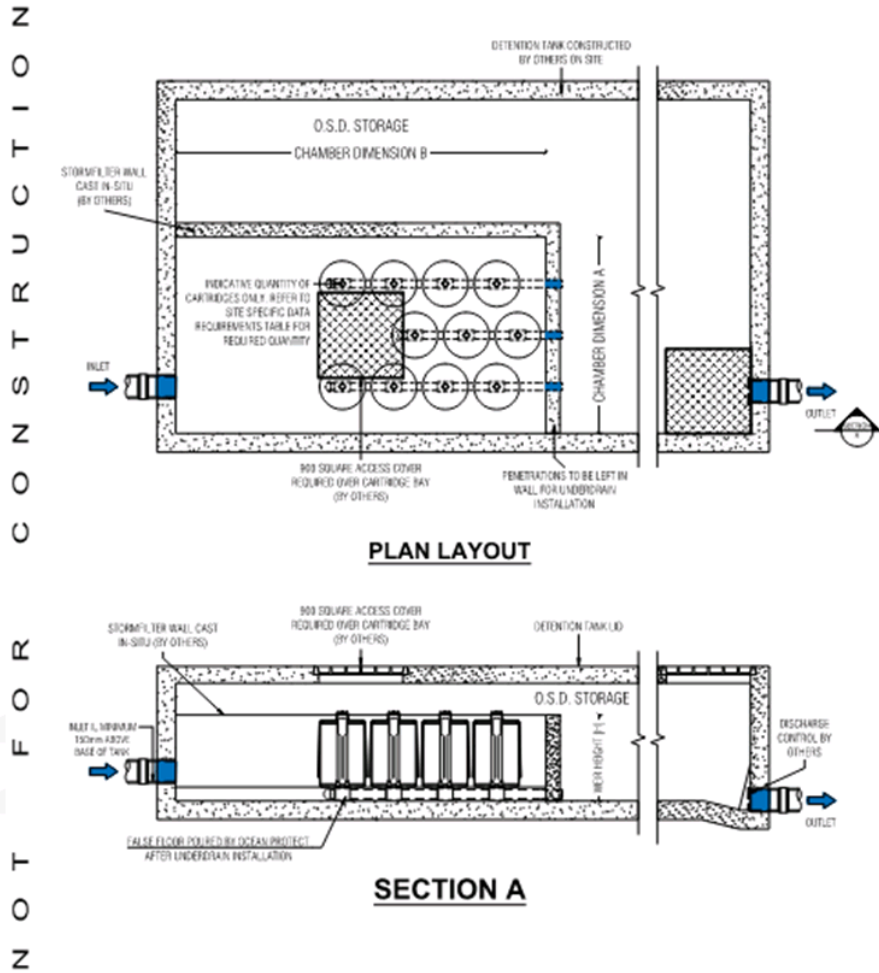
TYPICAL LAYOUT OF THE OCEANPROTECT STORMFILTER CATRIDGE TREATMENT SYSTEM INSTALLED WITHIN A UNDERGROUND CONCRETE DETENTION TANK
